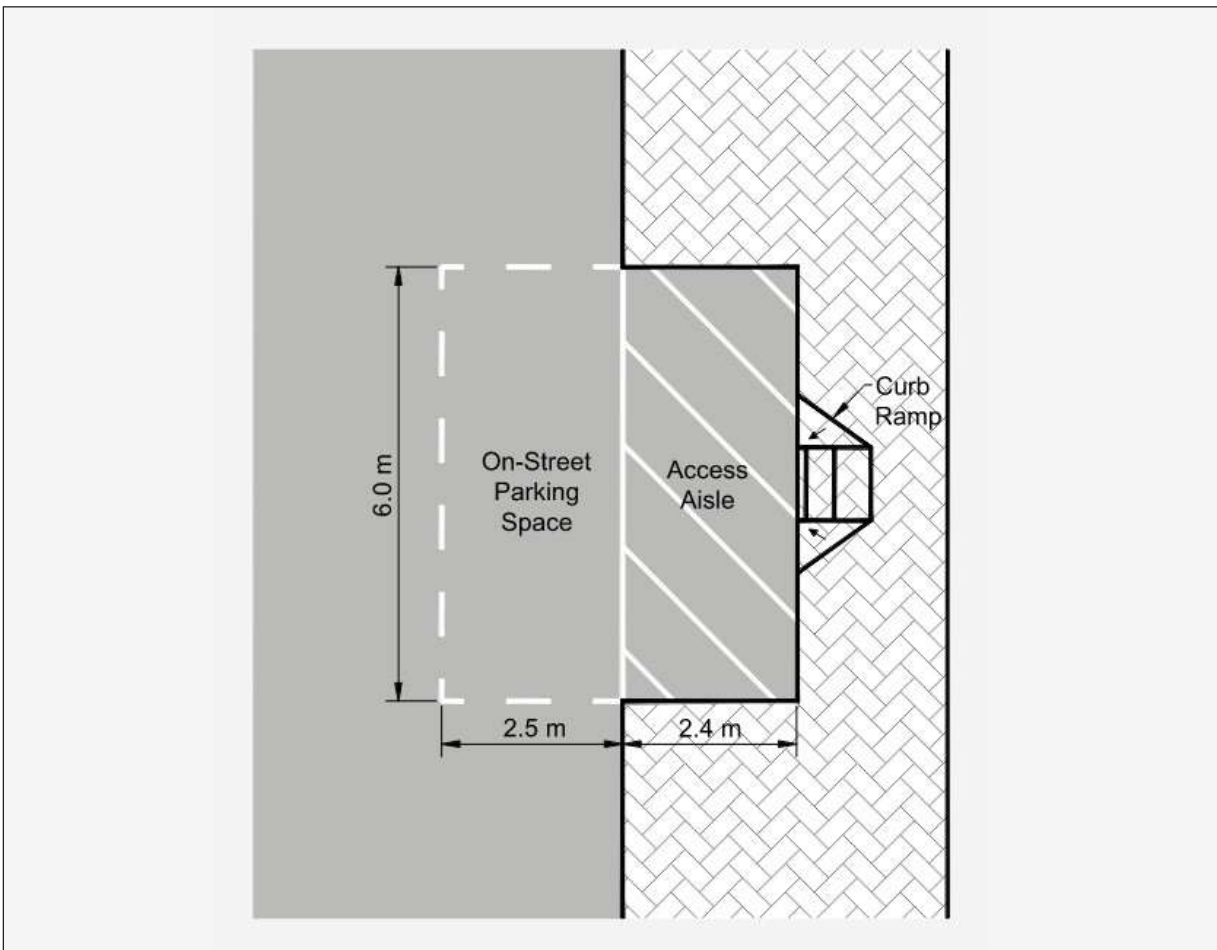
On-Street Parallel Accessible Vehicle Parking Stall Layout
